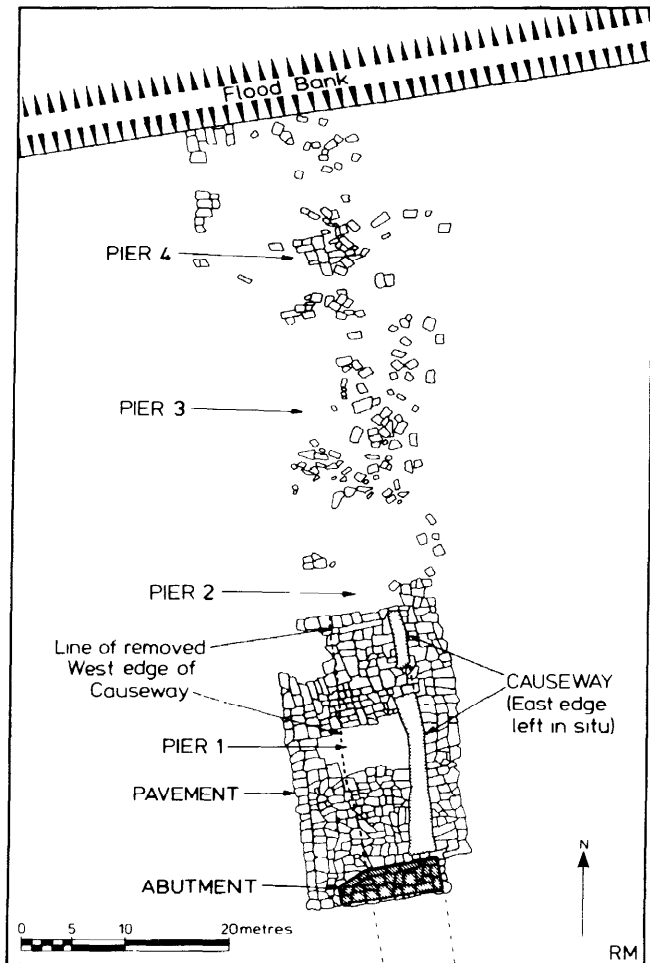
Plan of the stone bridge at Piercebridge (R Mills)
